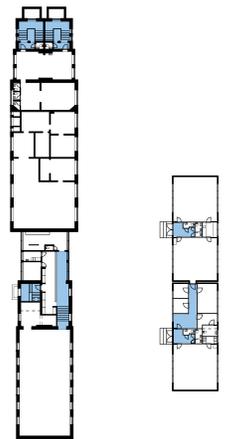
Plans of Byskolen indicating hallways and stairs Scale 1:1250
